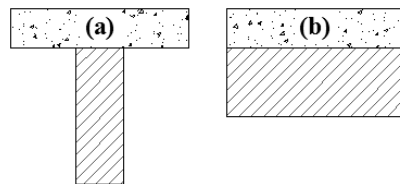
TCC bridge configuration (a) T-beam; (b) slab [15]
